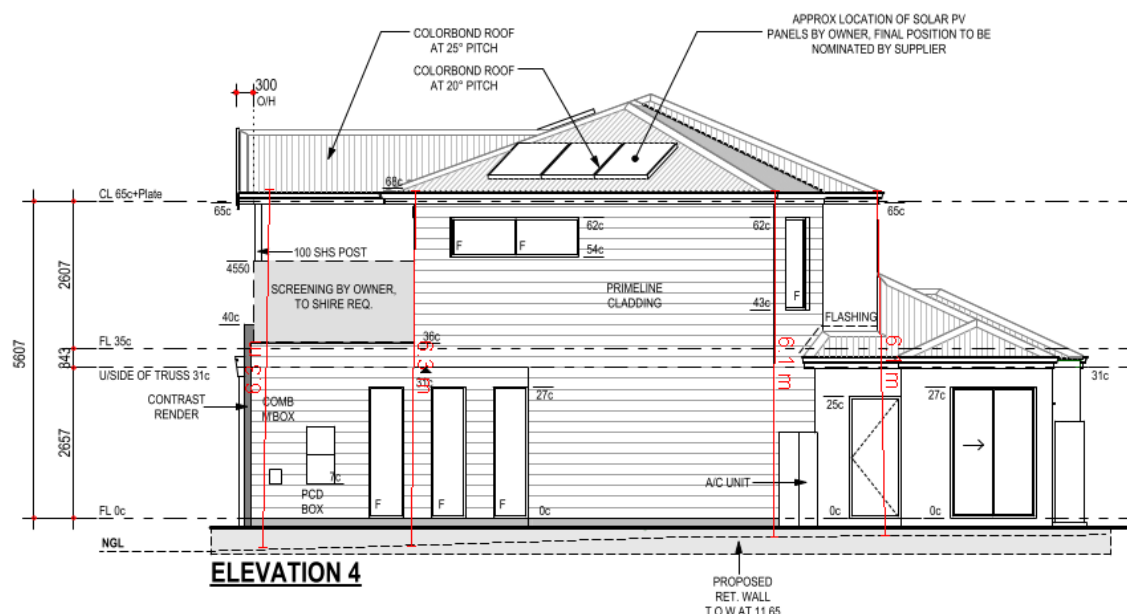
Elevation of proposed dwelling illustrating areas exceeding the building height requirement
